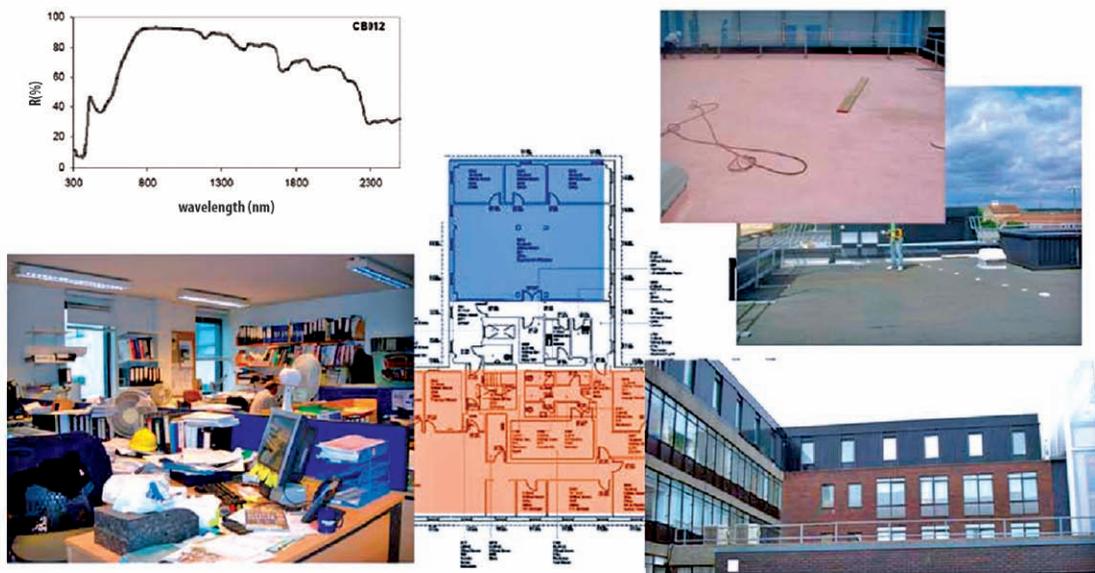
Floor plan and photos of the office and roof including the solar reflectance of the cool material applied
